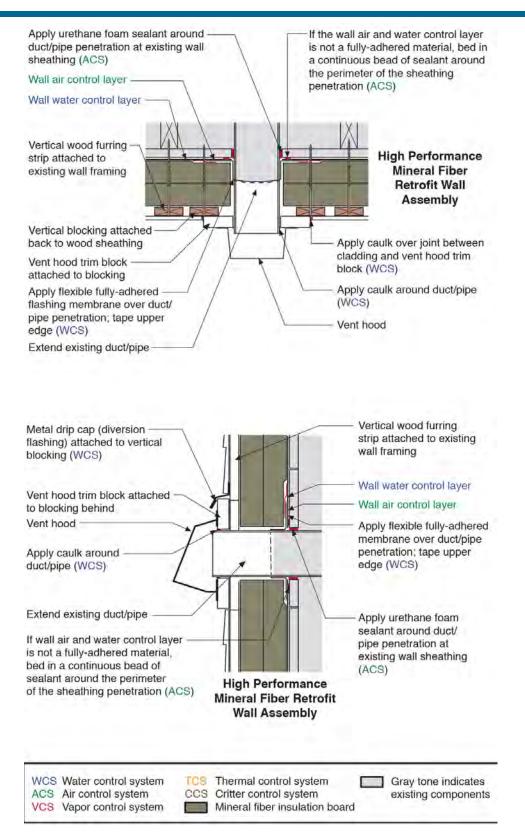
Schematic plan and section details for duct penetration and vent hood trim mount in a high performance mineral fiber retrofit wall assembly
